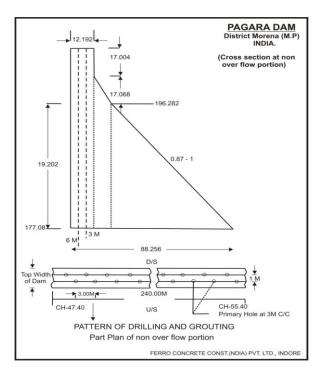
Section of non-over flow, Pagara Dam. Showing drilling & Grouting pattern in plan.
